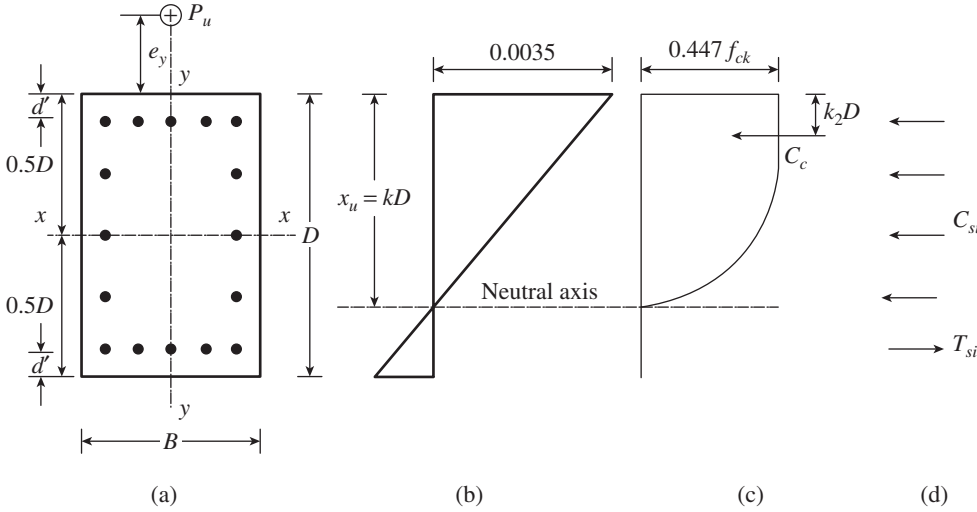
Stress–Strain diagram when neutral axis is inside the section (a) Column section (b) Strain diagram (c) Concrete stress diagram (d) Steel forces
